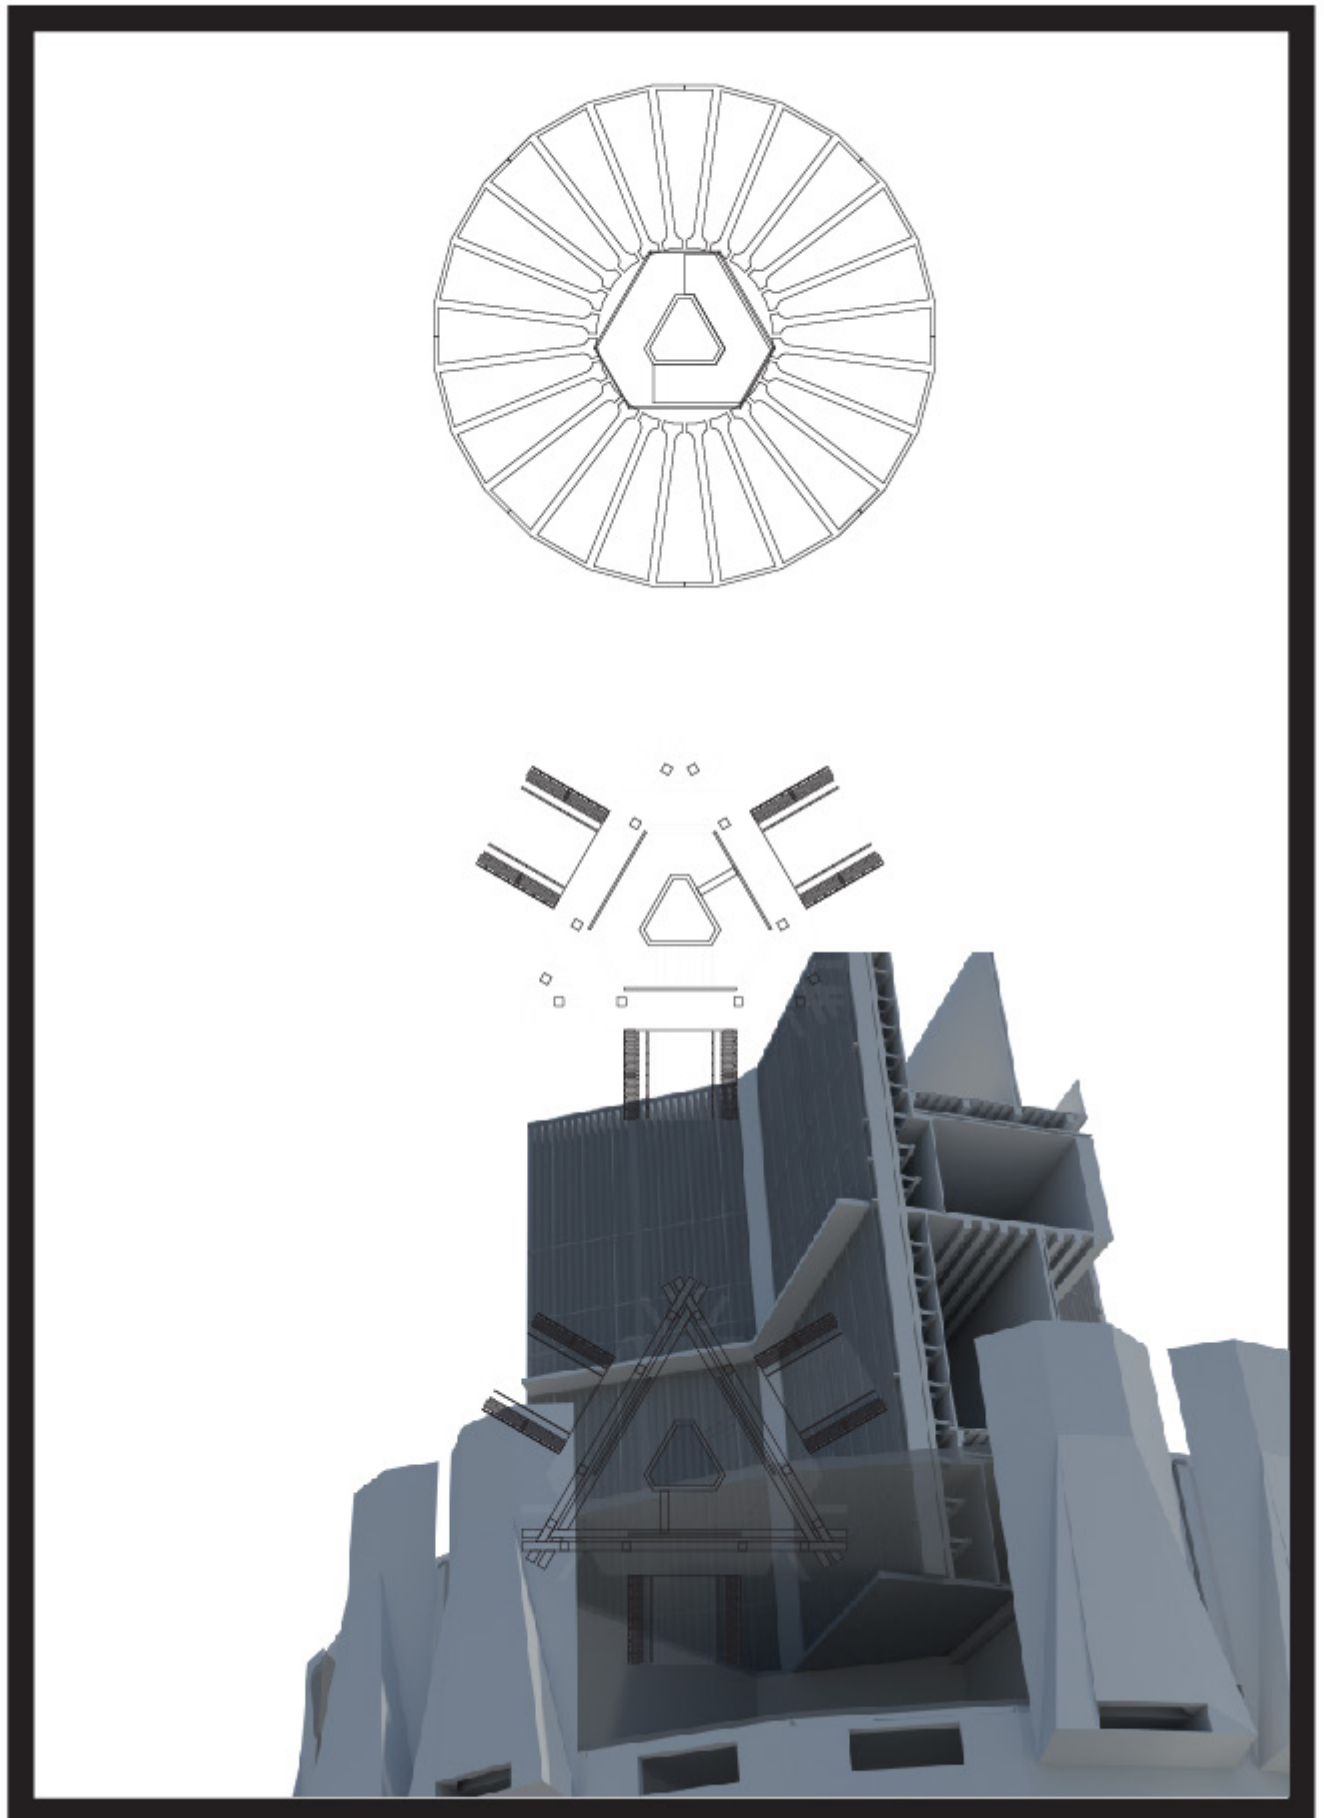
Macro Scale (Core) Image - Plan Component Section (Preliminary)
